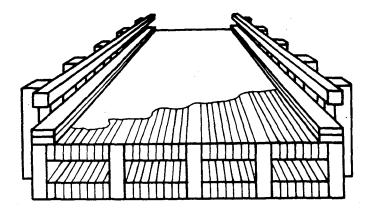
Stressed Box Beam Bridge (Source: Barry Dickson, West Virginia University)
